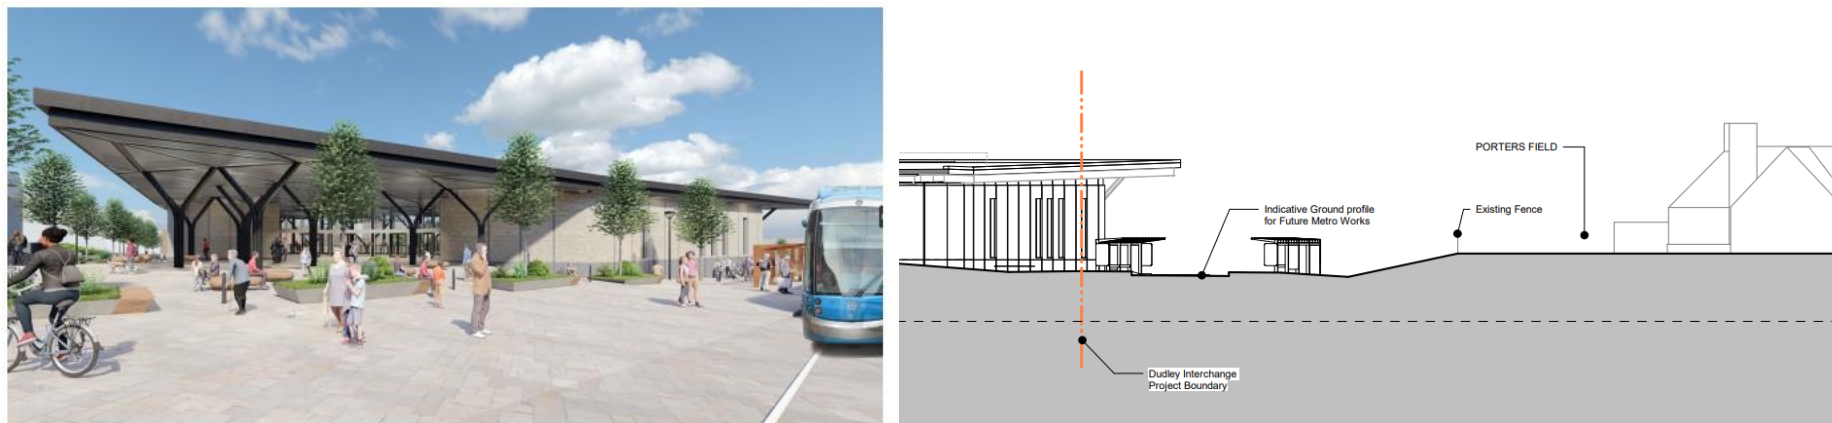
3D views of the Interchange and landscaped piazza linking with the Metro platform and cross section of the new Interchange building in relation to existing Metro Bar and Portersfield North (Area 1)
